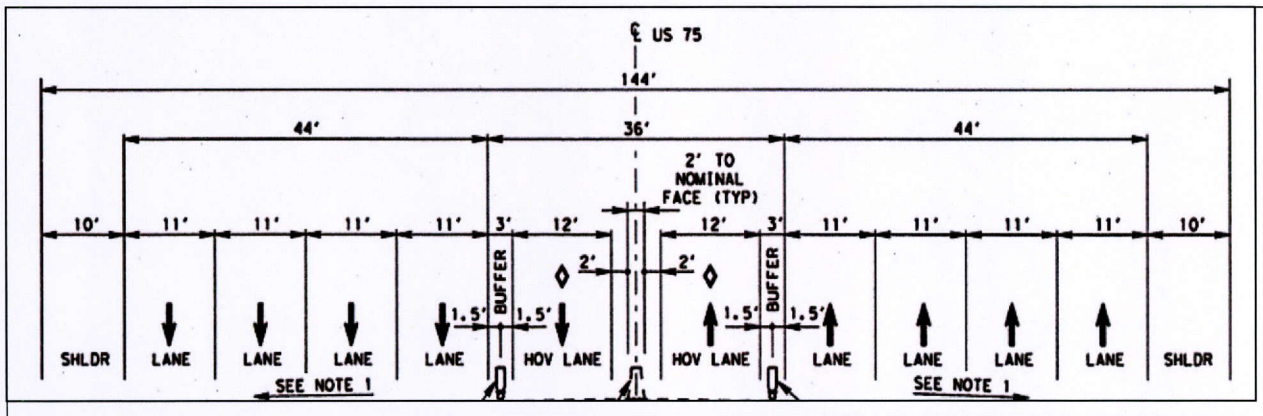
Typical Cross Section of the US 75 Facility in Dallas (6).
